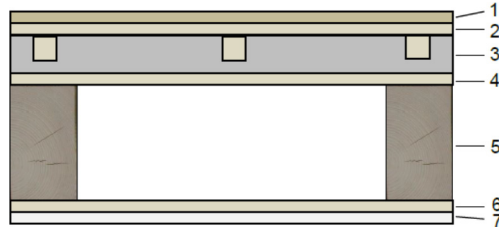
Schematic of a traditional Austrian wood-beam ceiling construction; 1) Floor covering, e.g. parquet flooring; 2) blind floor, typically softwood; 3) backfill; 4) formwork; 5) wood beams with app. 80 cm distance; 6) recessed formwork; 7) gypsum plasterboard
